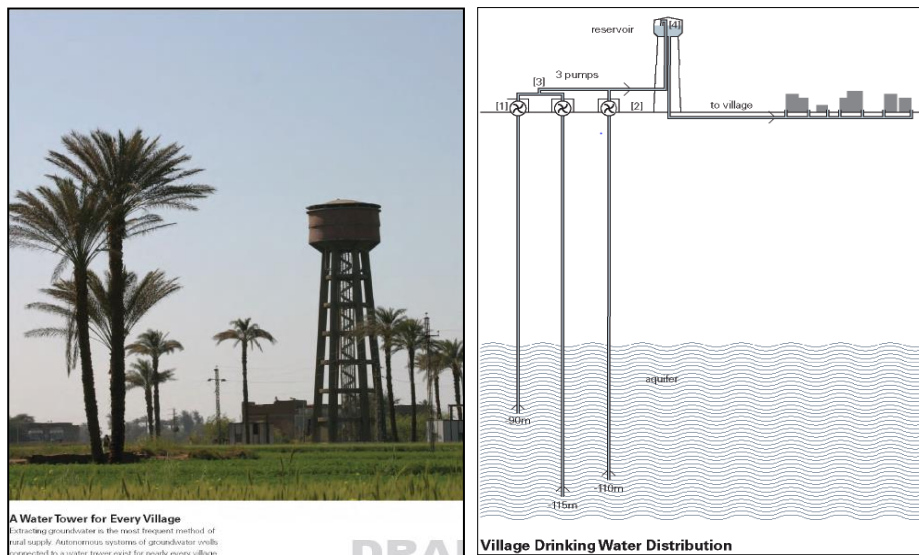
Left: A view and a Cross section for Water Towers system which are almost installed in every Egyptian village. (Water Management, Building on Fluid Availability, 2009).
